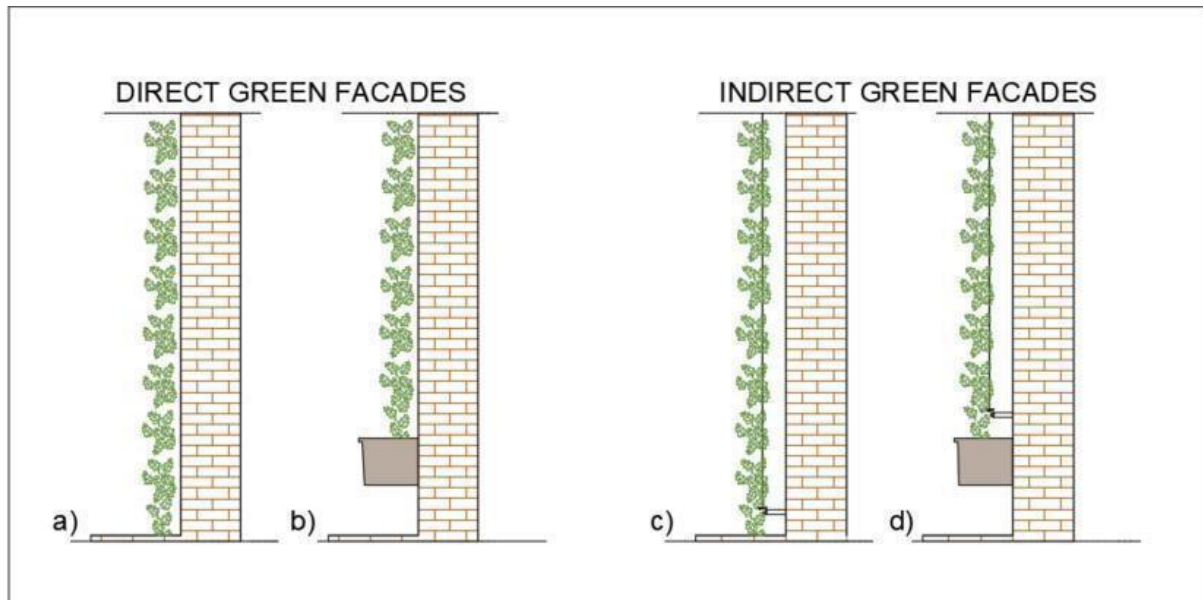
Different types of Green Facades: (a) Direct Green Facade with vegetation planted into the soil; (b) Direct Green Facade with plants rooted in the box; (c) Indirect Green Facade with vegetation planted into the soil; (d) Indirect Green Facades with plants rooted in the box [41].
